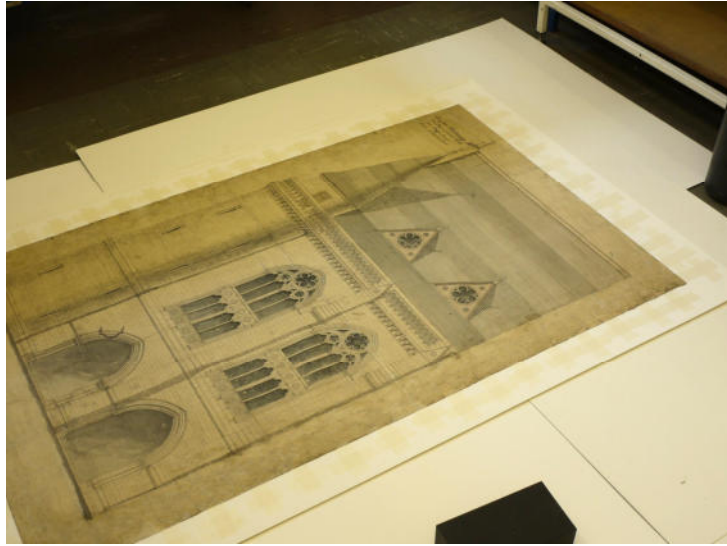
Architectural drawing of the two bays of Great Hall showing turret with lancet windows, arches, lancet windows with tracery, stringcourse and rusticated masonry, c. 1867, ref. BUL 6/1/36, image shows plan mounted to a back-museum board during exhibition preparation. Photograph by Ela Gorska-Wiklo
